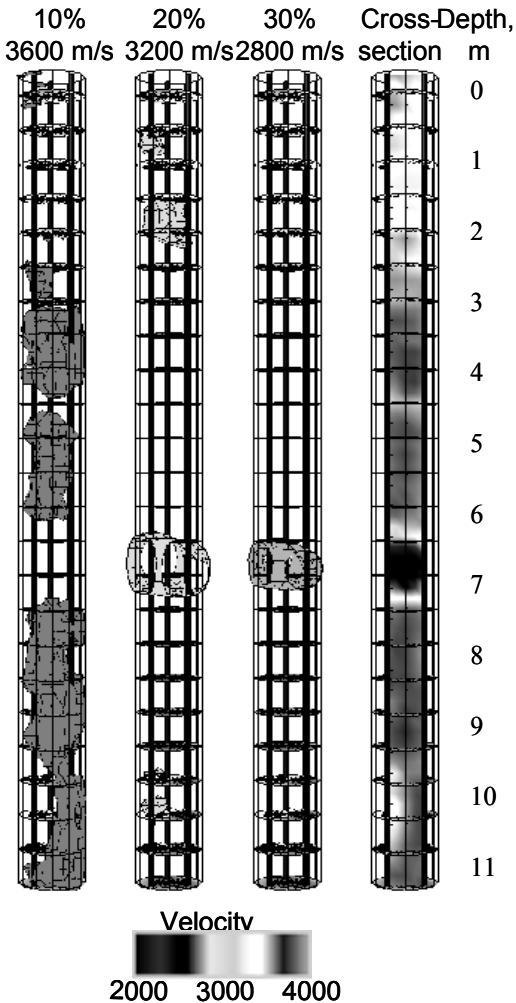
Cross-section Tubes 1 & 2 – Abutment 2, Shaft 4 (A2-4).
